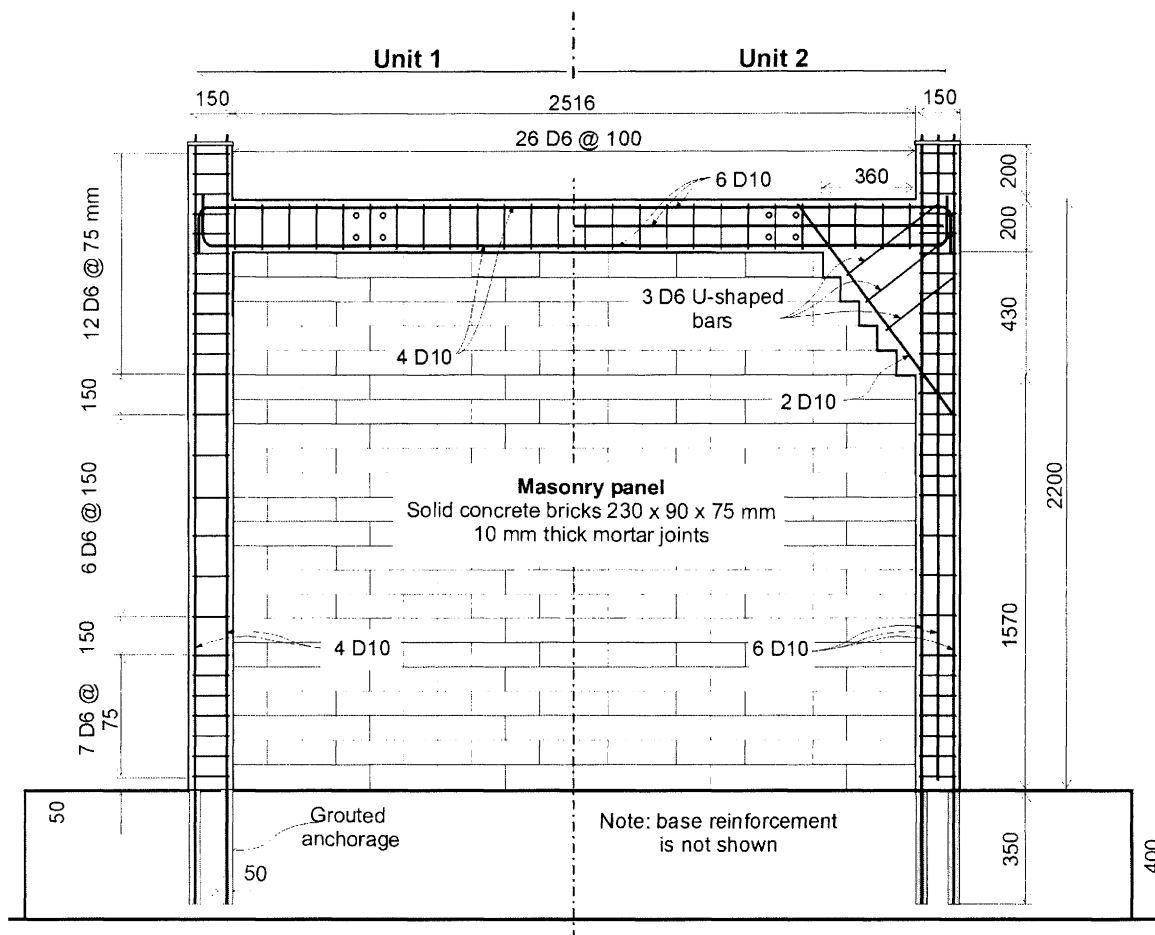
Reinforcing details and dimensions of Units 1 and 2.
